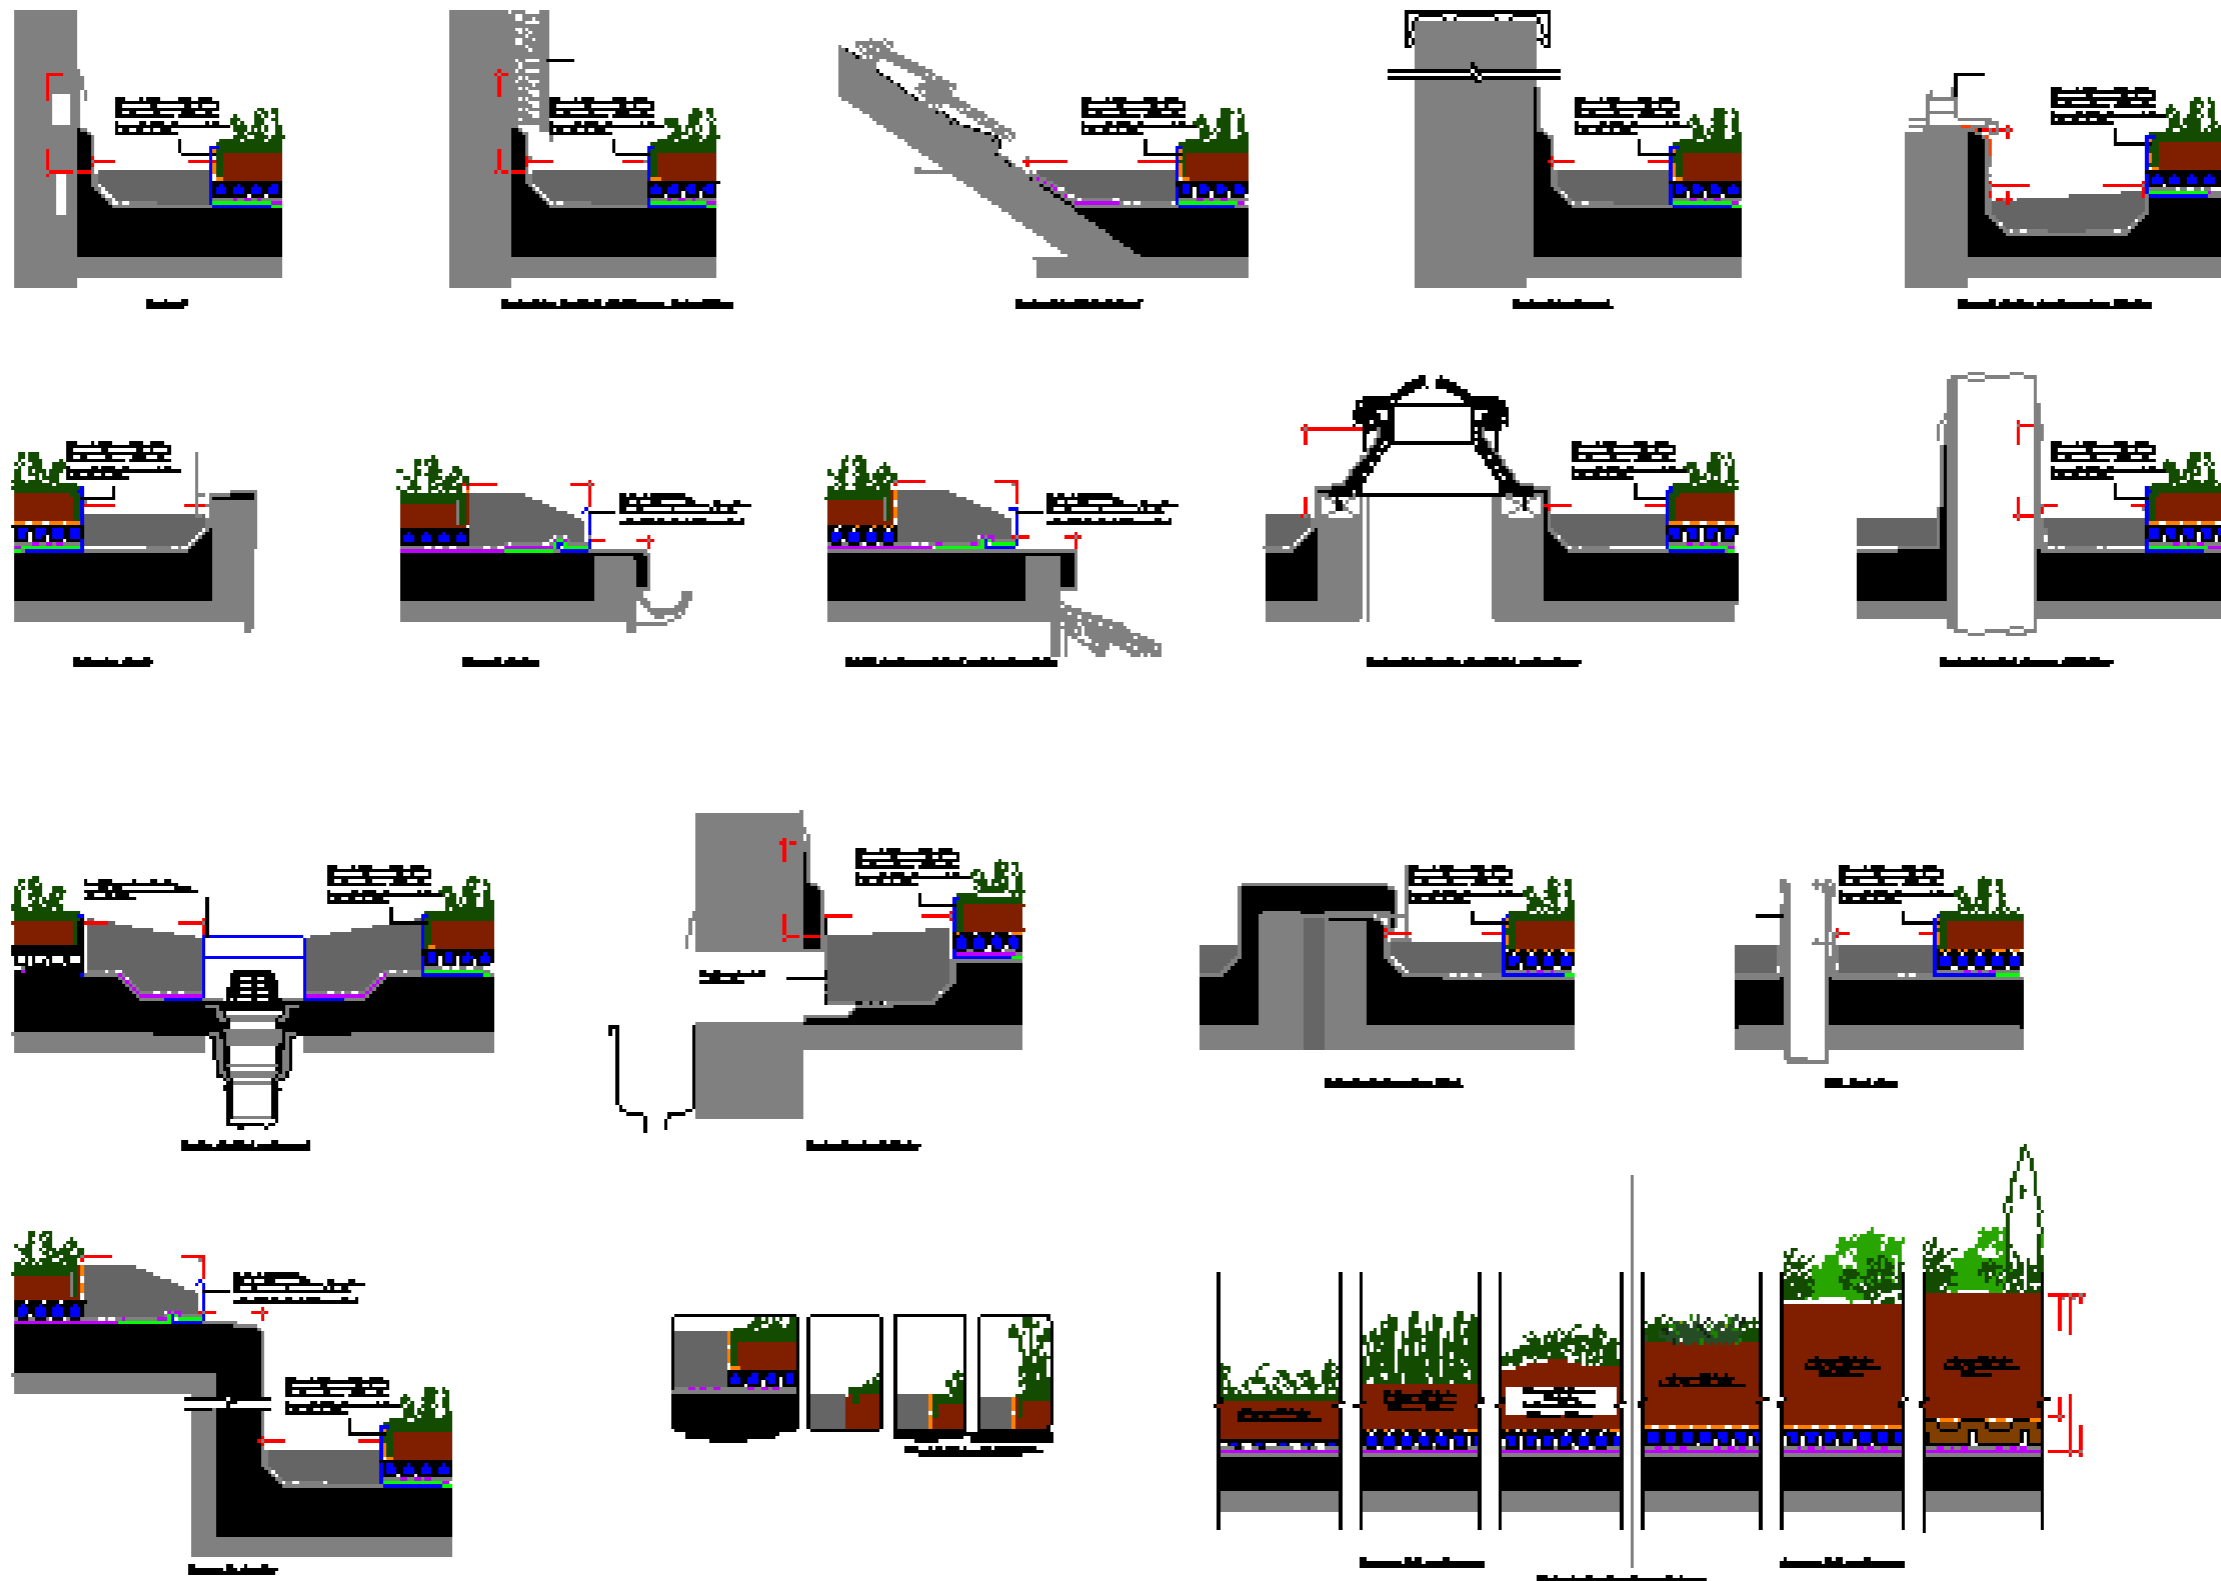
Bauder Green Roof Details (Bauder, 2021)
